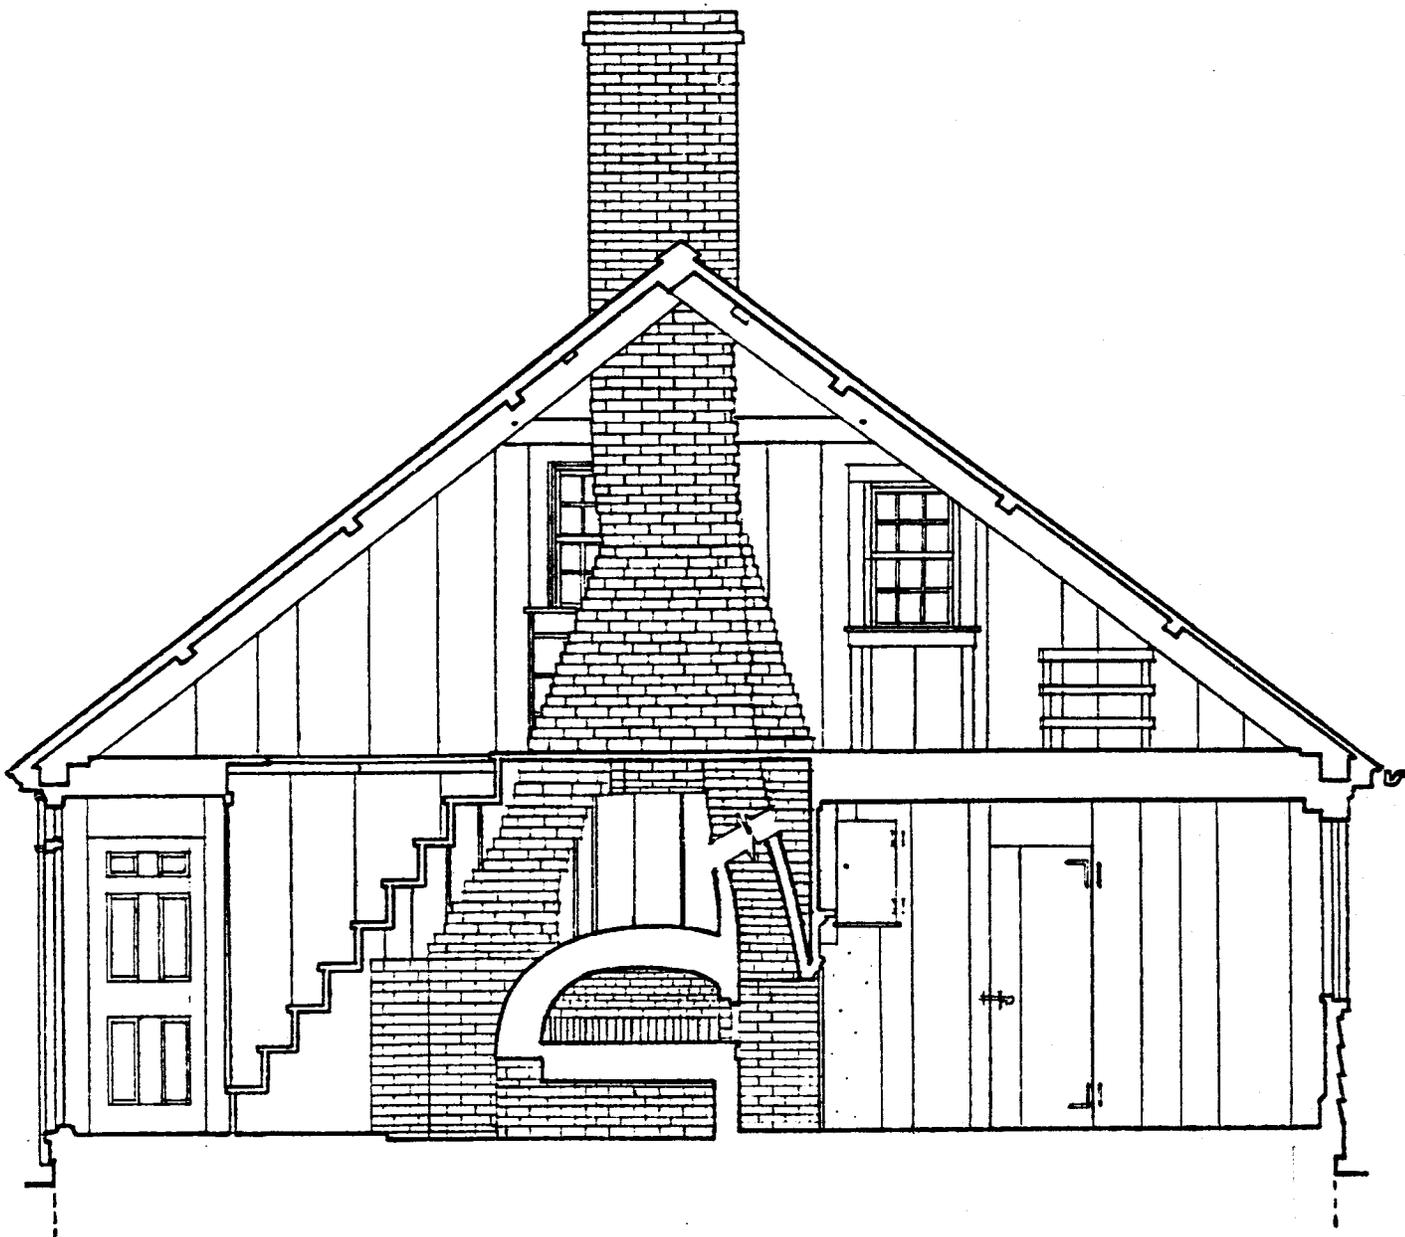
Atwood-Higgins House: Transverse Section, South Attic Stair and East Kitchen.
